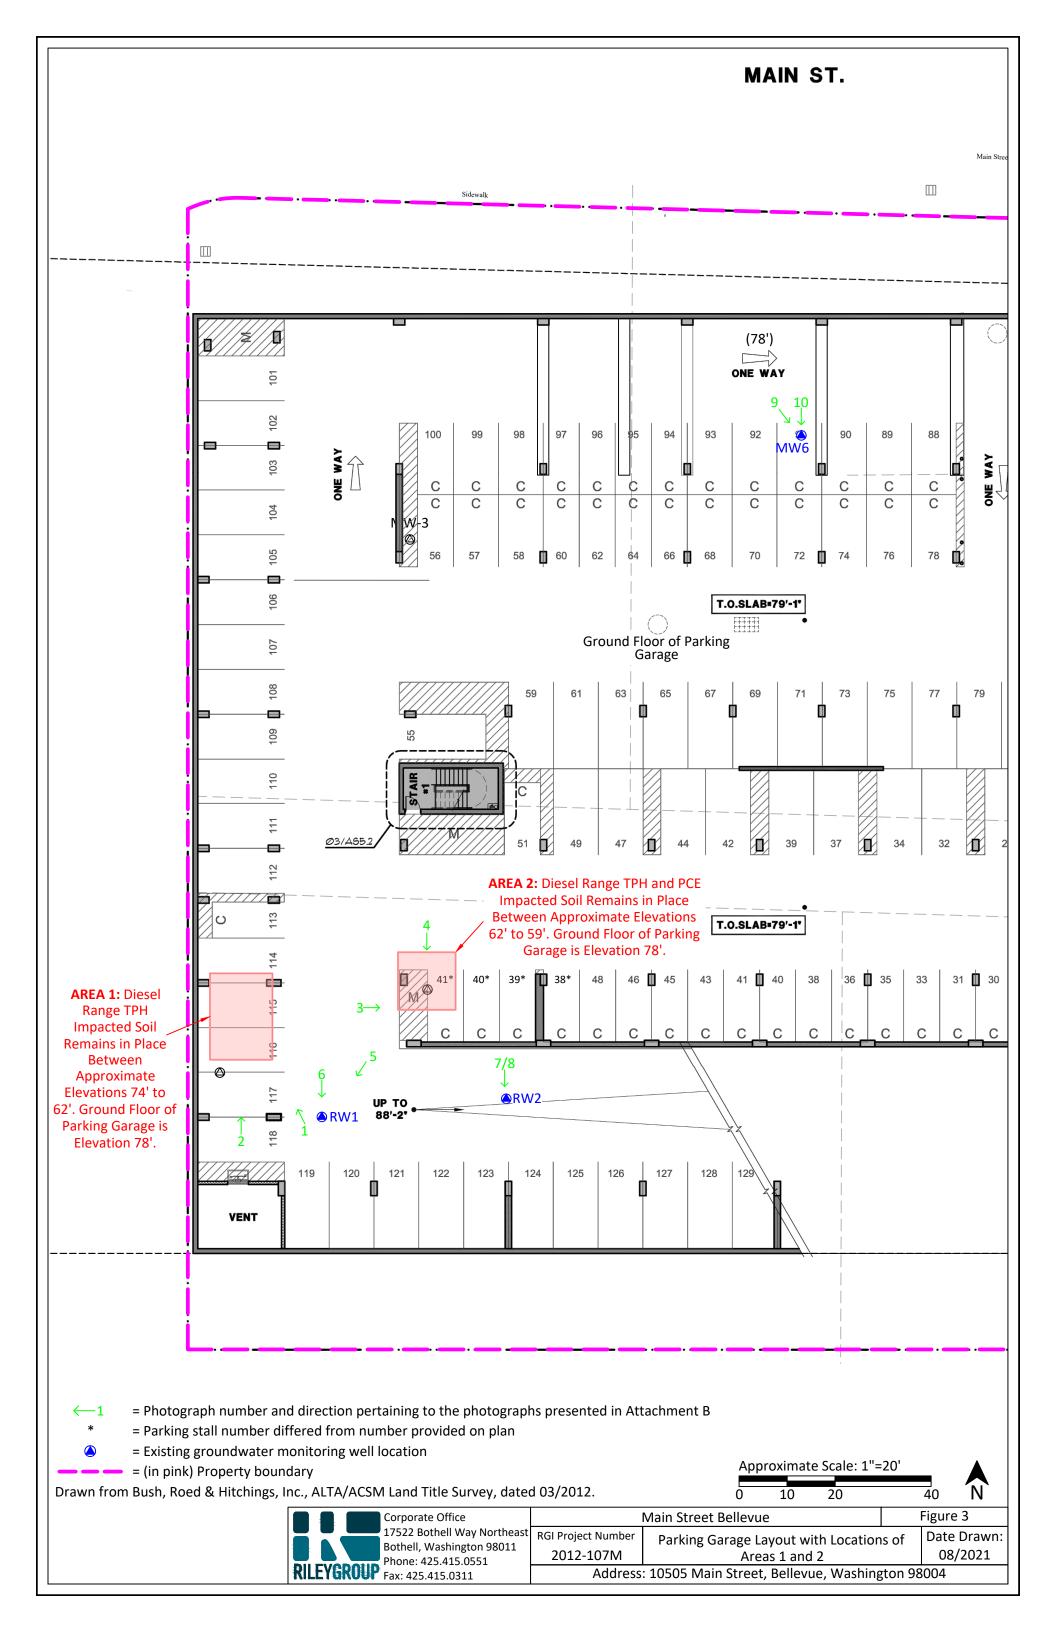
, Garage Floor Layout With Locations of Areas 1 and 2
